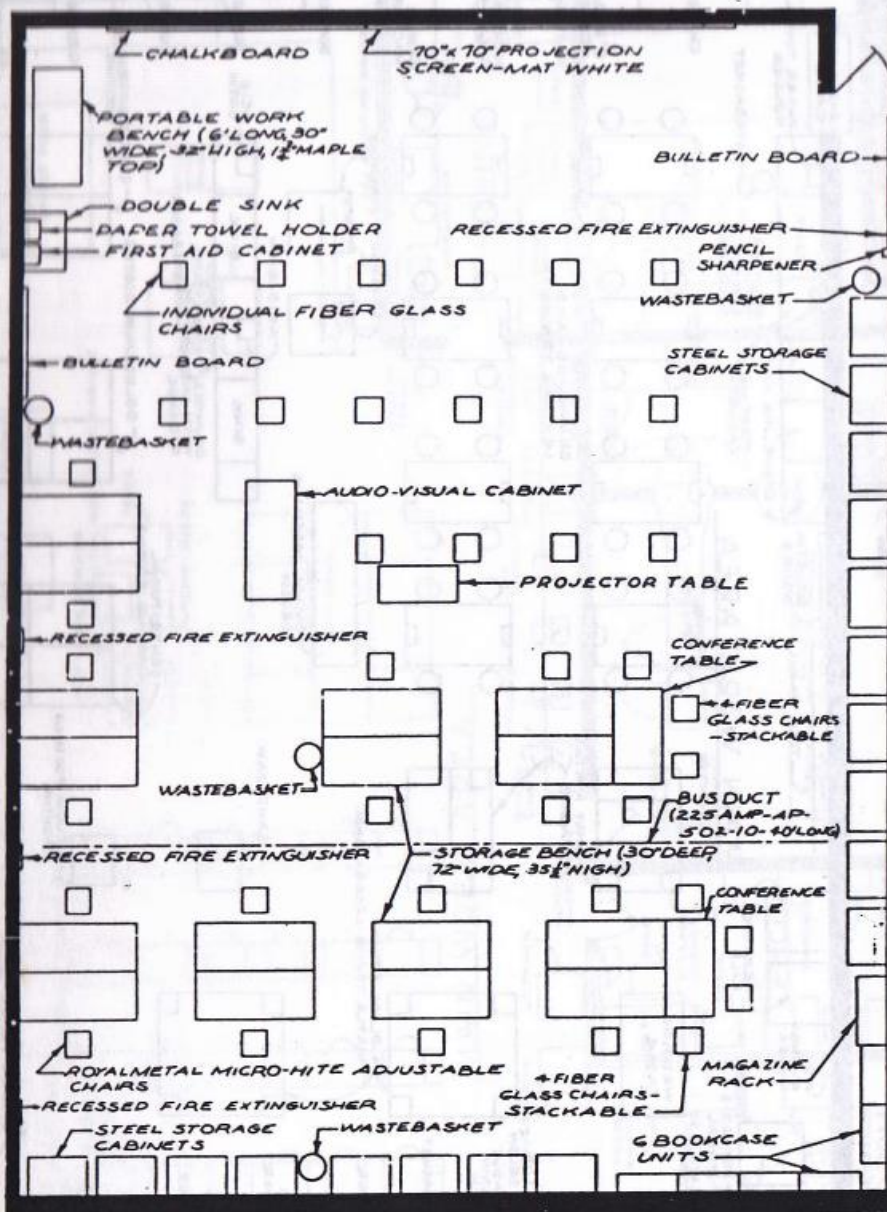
Laboratory layout for a 16' x 40' utility lab.
